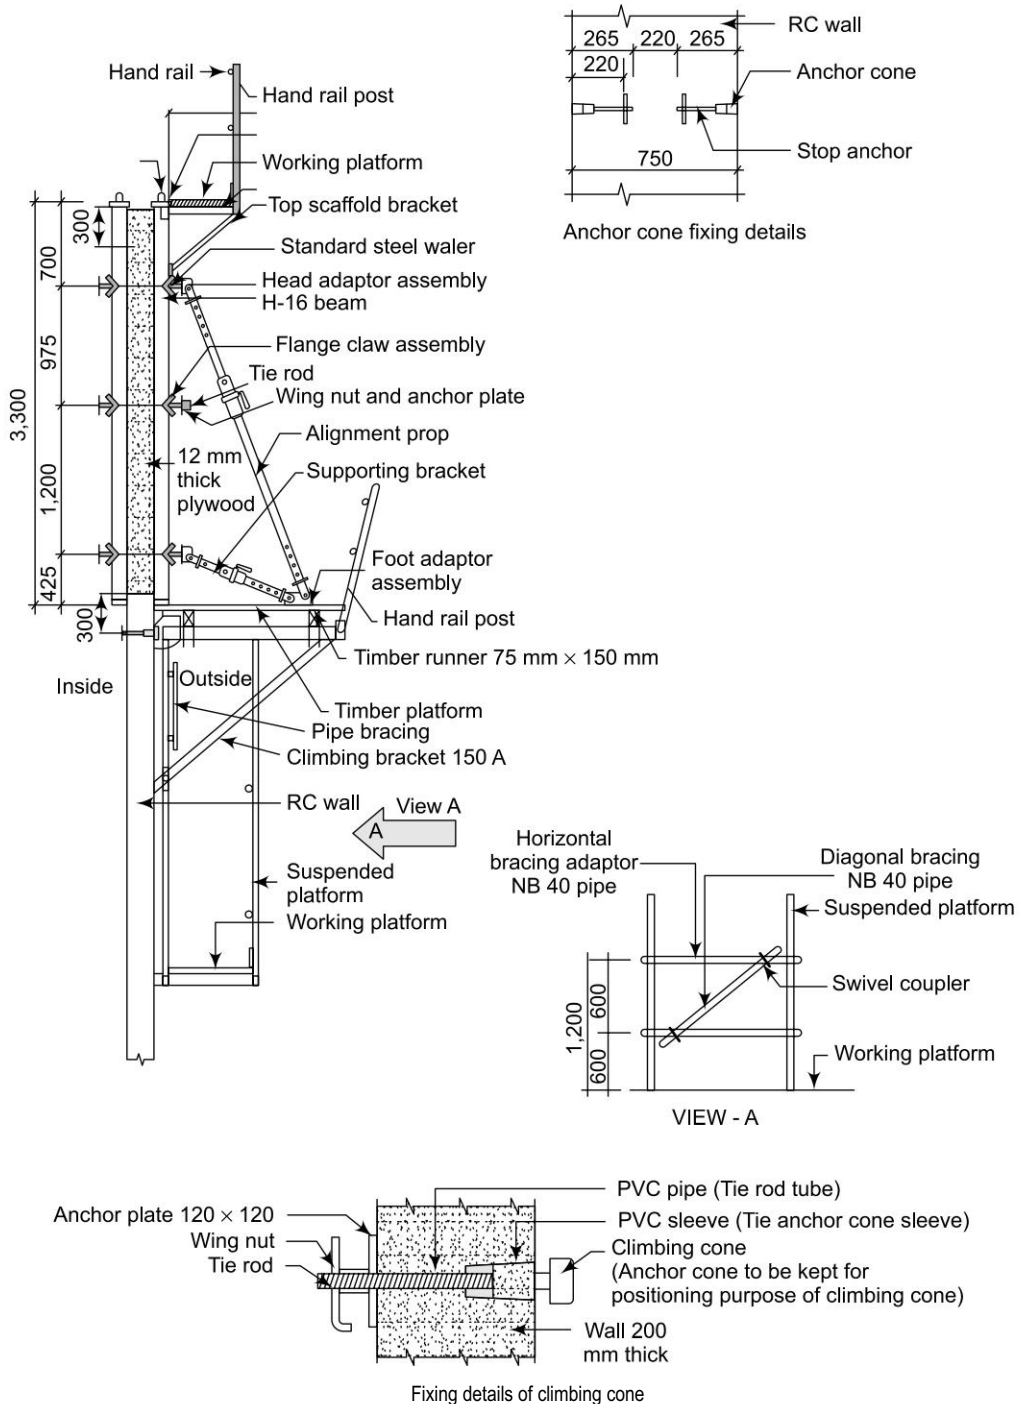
Typical Details of Climbing Formwork CB-150A.
